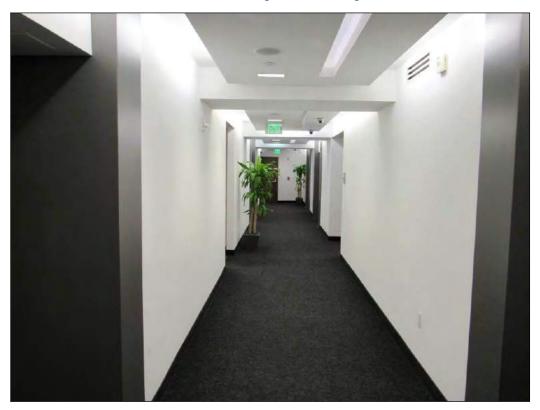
Modern office spaces located on the third floor, again showing the lack of historic fabric and destruction of the original layout, facing north.
